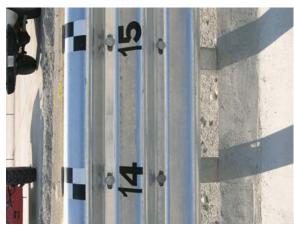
Approach Guardrail Transition to Concrete Barrier System
